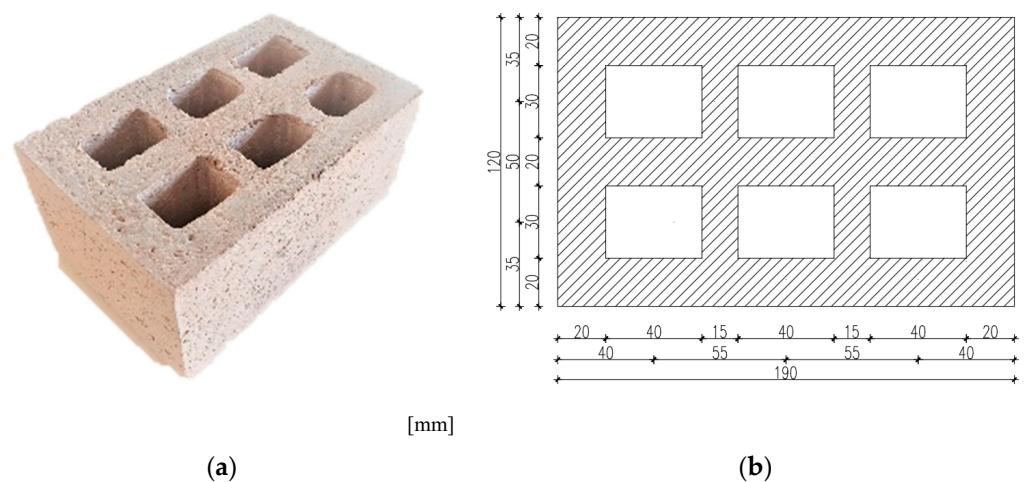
Concrete masonry block– RBC-EP (a) photo of the block, (b) block dimension in mm.
